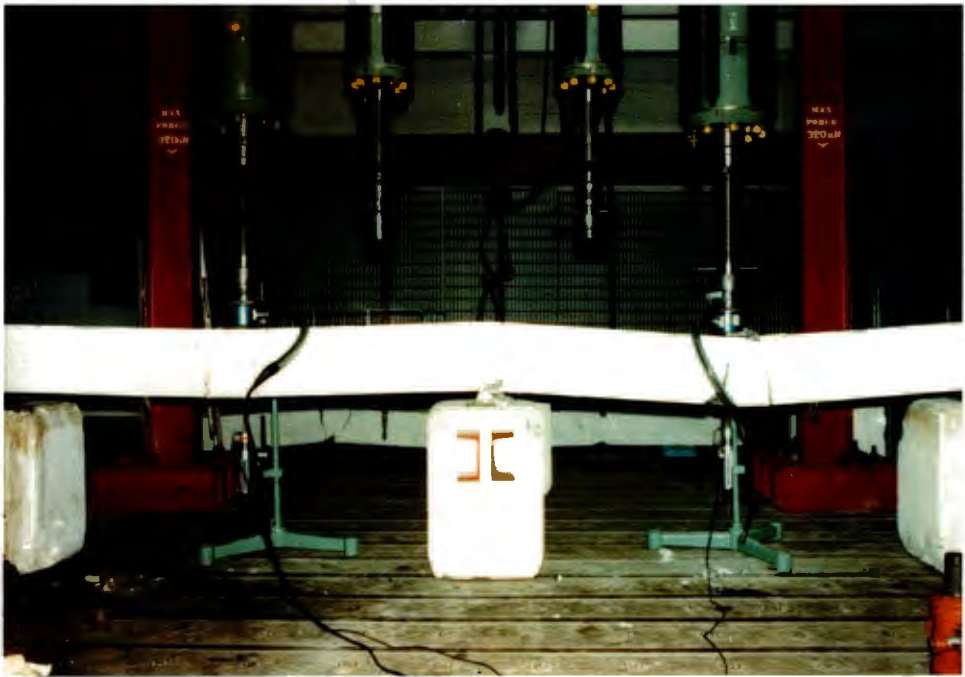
Beam FS12 at failure: Beam failure in the right span and over the interior support.
